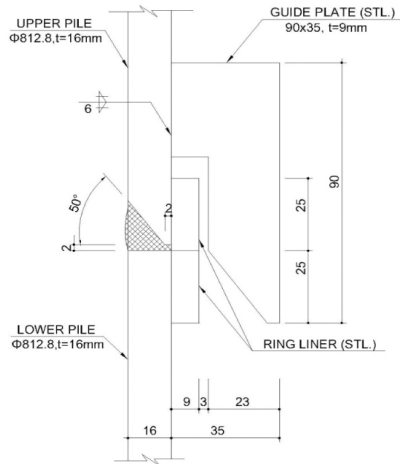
Welded Joint Details for Steel Pipe Pile(D812.8)
